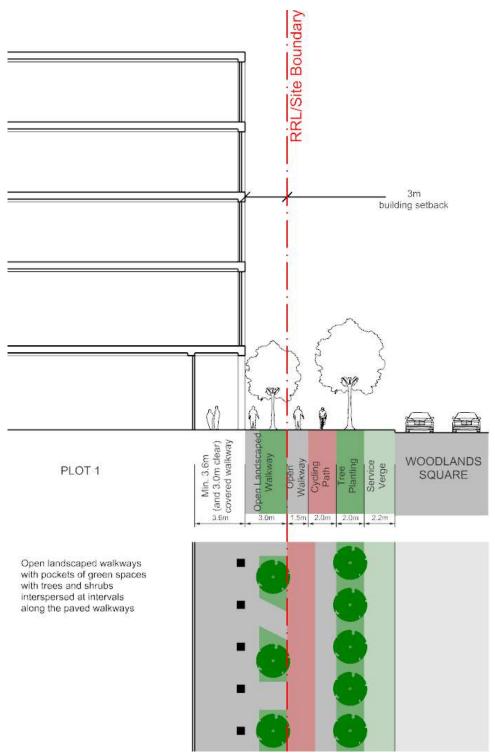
Section and plan showing 3.0m building setback area within Plot 1 along Woodlands Square and South Woodlands Drive
